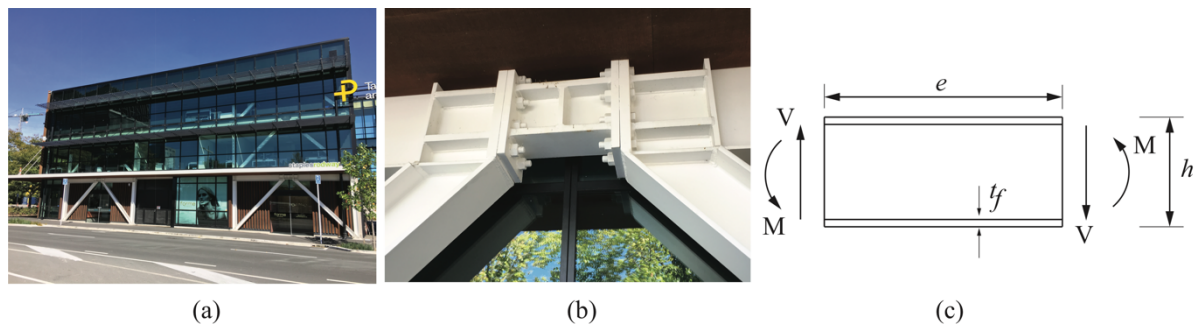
3-story steel frame building with EBF system and free-body diagram of EBF link (photos courtesy of Prof. Dr. D. Lignos)
